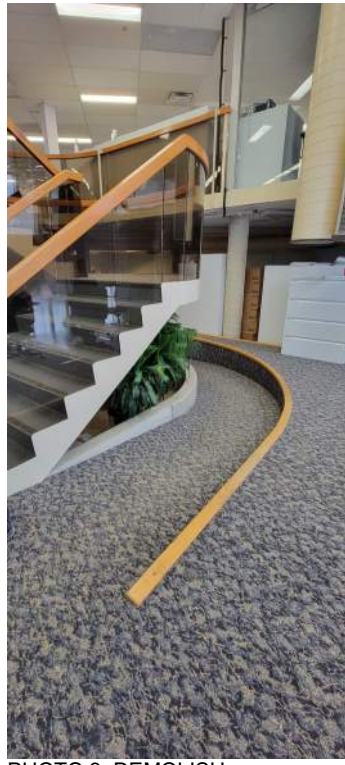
DEMOLISH INTERIOR RAMP, REMOVE CARPET AND WOOD TRIM
